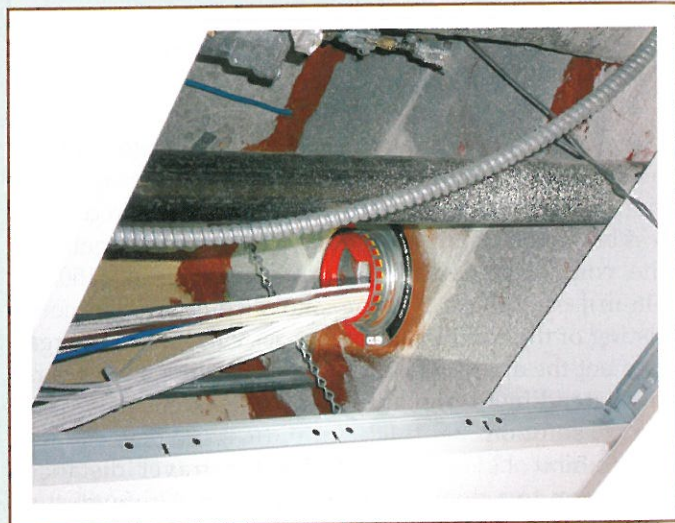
/19.87 Wiring and pipe penetrations of smoke barrier above ceiling.
